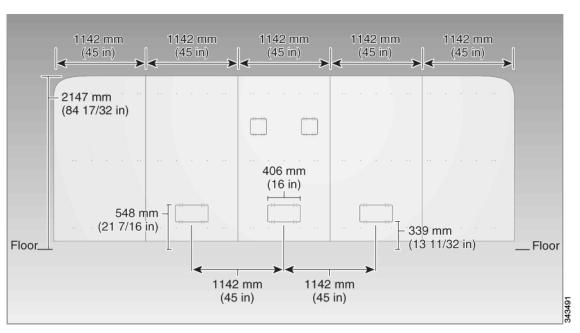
Location of Cutouts in the Wall-Mounted Reflector Wall
